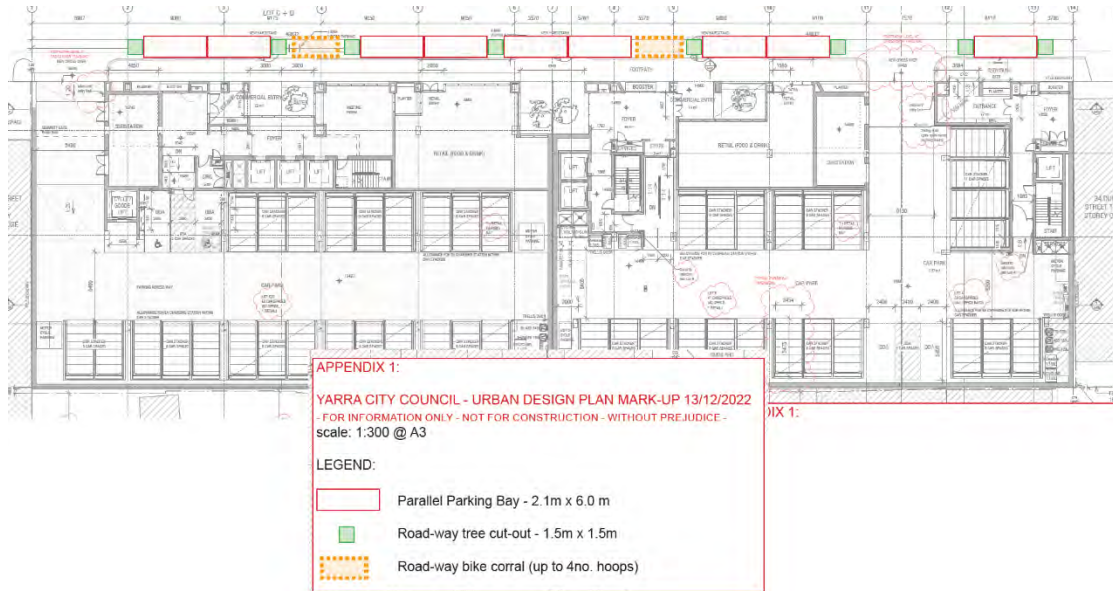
Urban Design Plan Mark-up Plan provided by Council’s Urban Design Unit.
